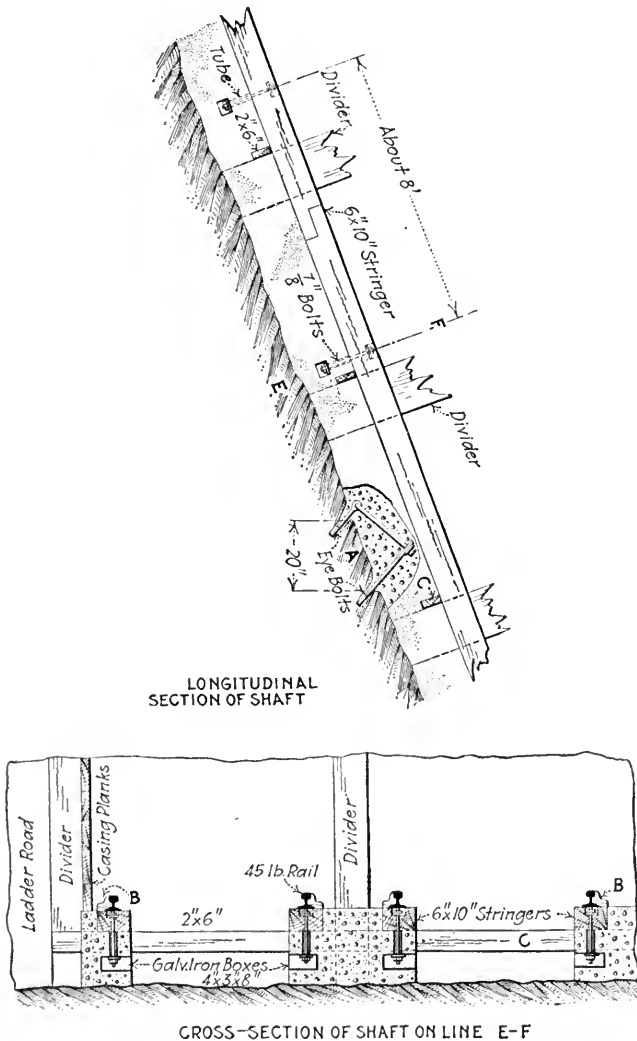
ANCHOR FOR STEEPLY INCLINED CONCRETE SKIPWAY.
